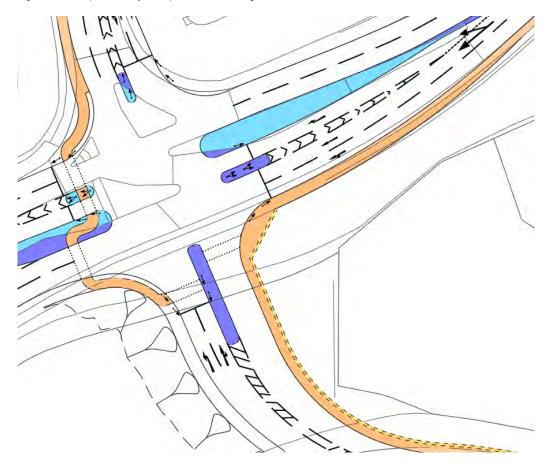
Developed footways and pedestrian crossings. Not to scale.
